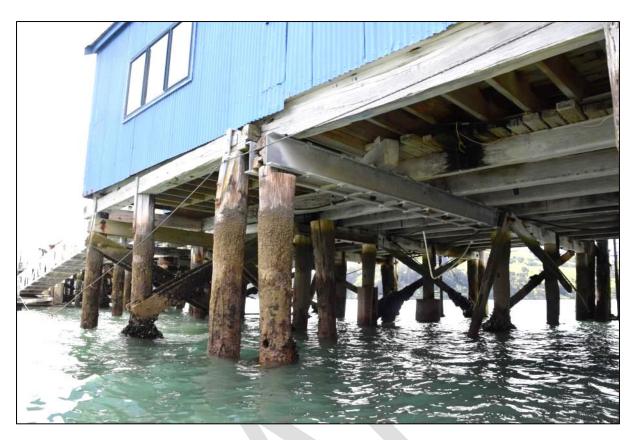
Steel beams either side of a pile cap. It is possible that the short section of diagonally-laid timber beam (cut face towards the camera) on top of the steel strengthening is where the original wharf structure narrowed at the end of the former wharf sheds.
